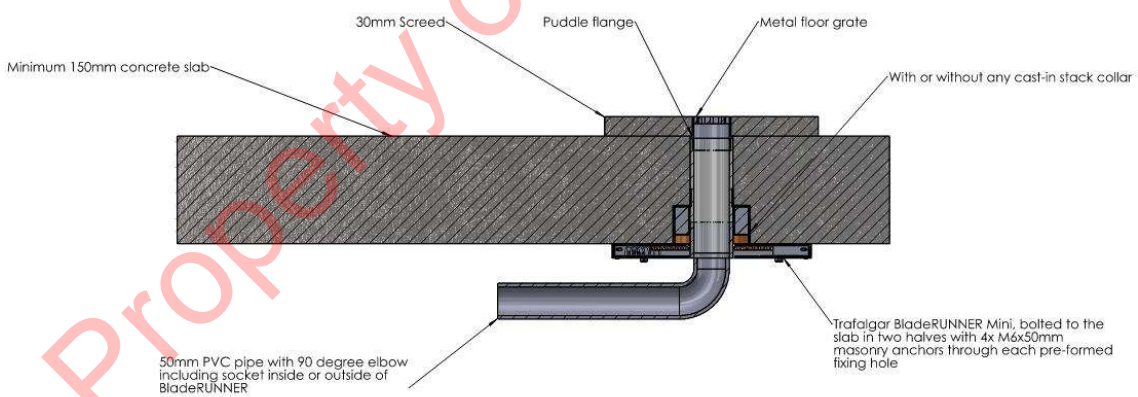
Trafalgar BladeRUNNER Mini installation showing existing cast in collar on a Ø50mm uPVC floor waste gully.
